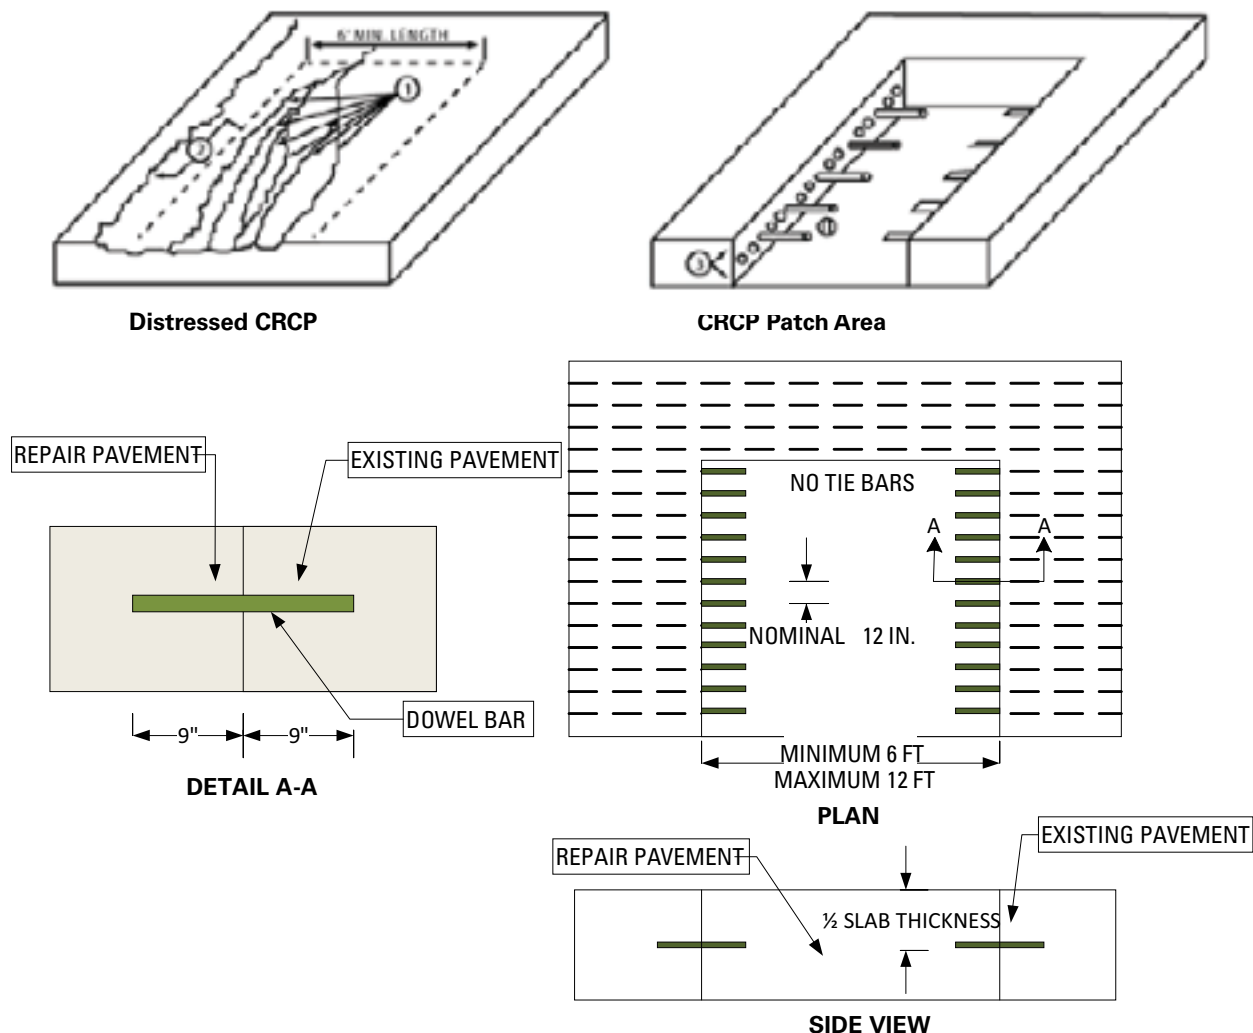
Details of the South Carolina jointed FDR of CRCP (Tayabji 2011)
